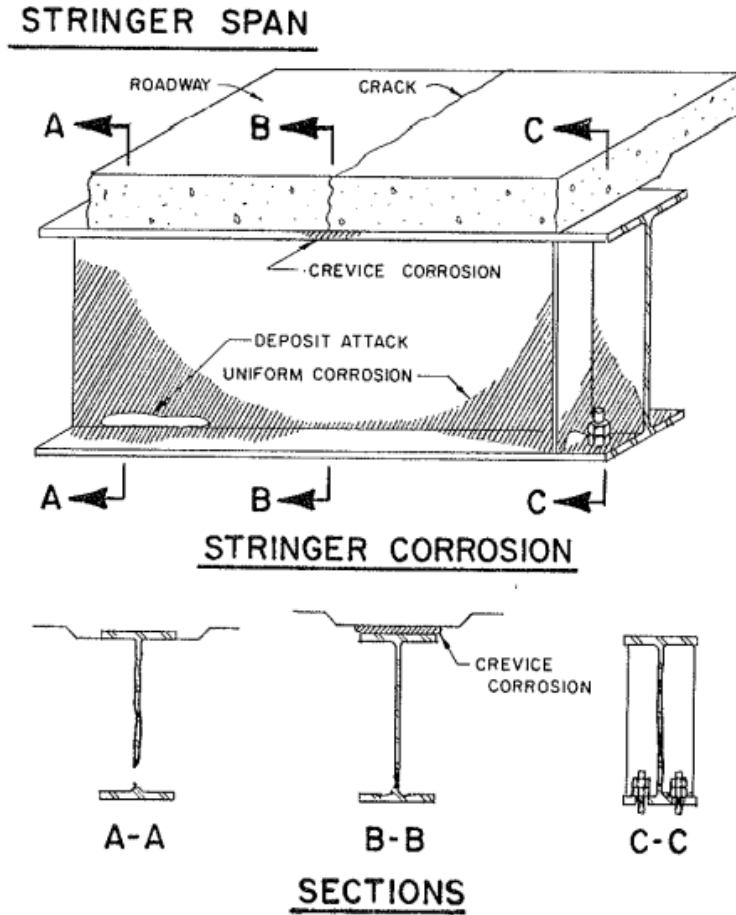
Locations and types of corrosion on girder bridges, [5].
